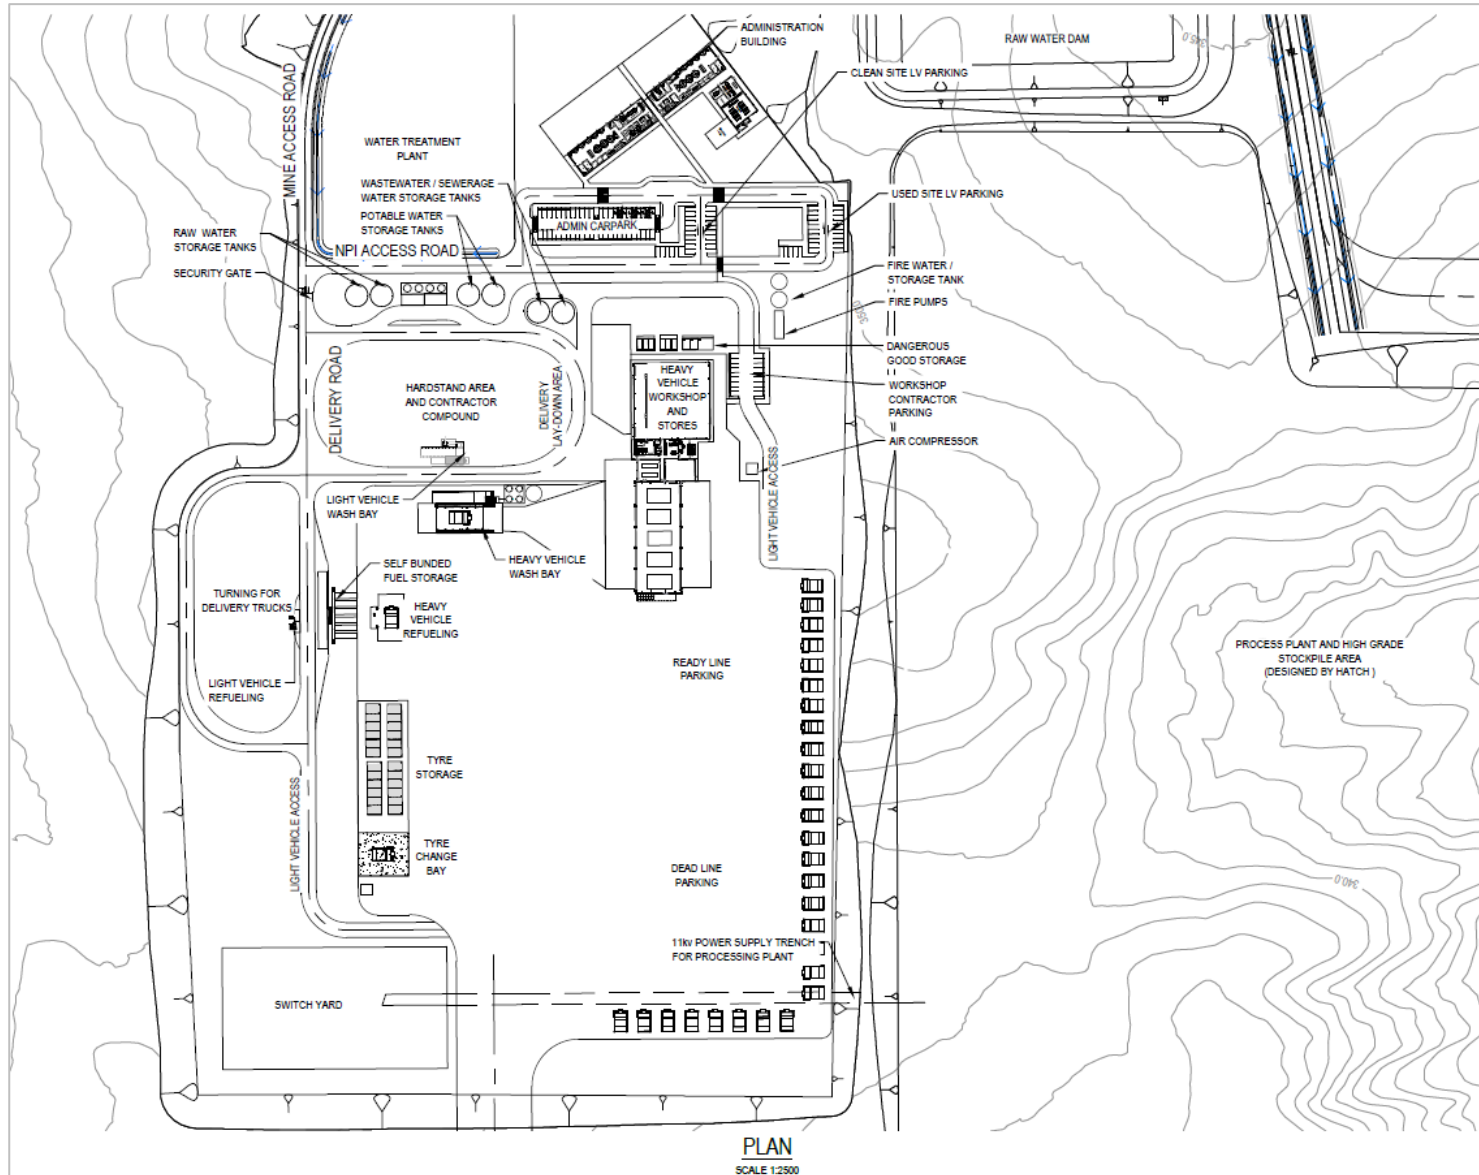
Non-Processing Infrastructure Area – proposed general arrangement
